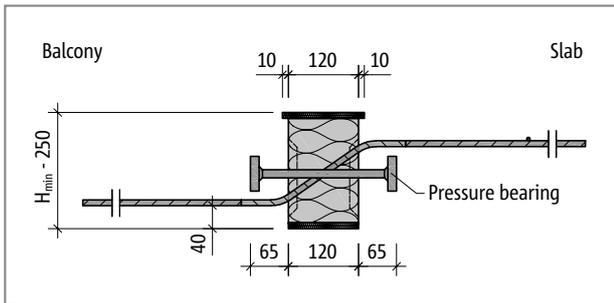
Schöck Isokorb® XT type Q-P: Product section
